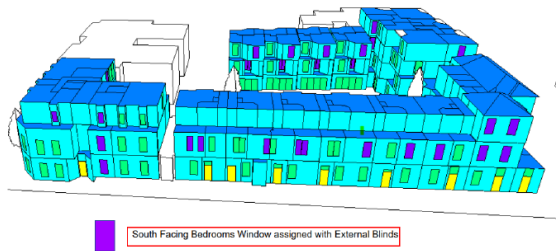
External Blind assigned for Bedrooms (South Elevation)
